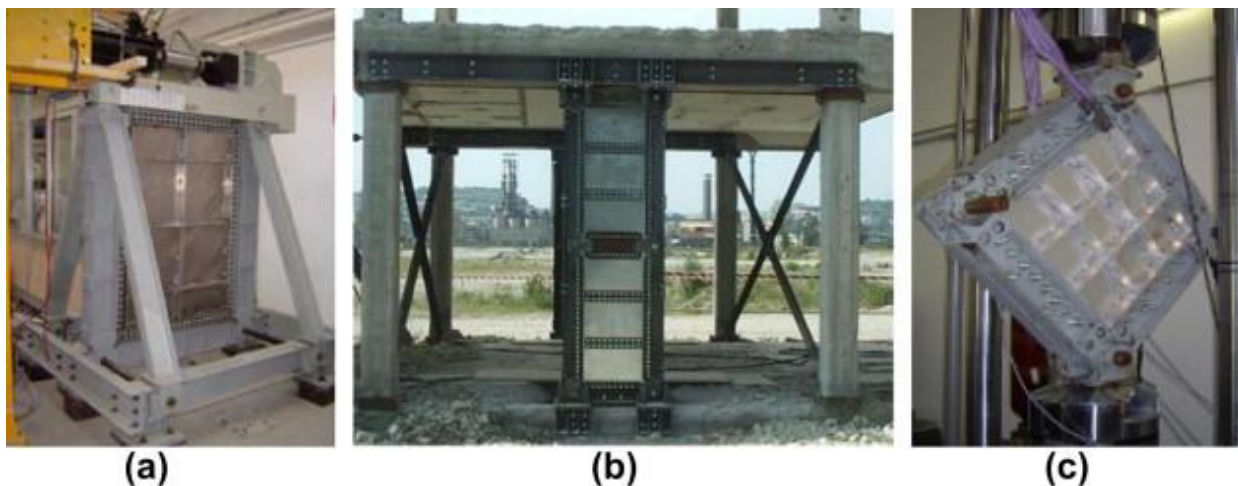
shows (a) Steel and reinforced concrete (b) frames equipped with infill pure aluminium shear panels; (c) pure aluminium shear panel arranged in a bracing type configuration subjected to diagonal tension compression [33]
